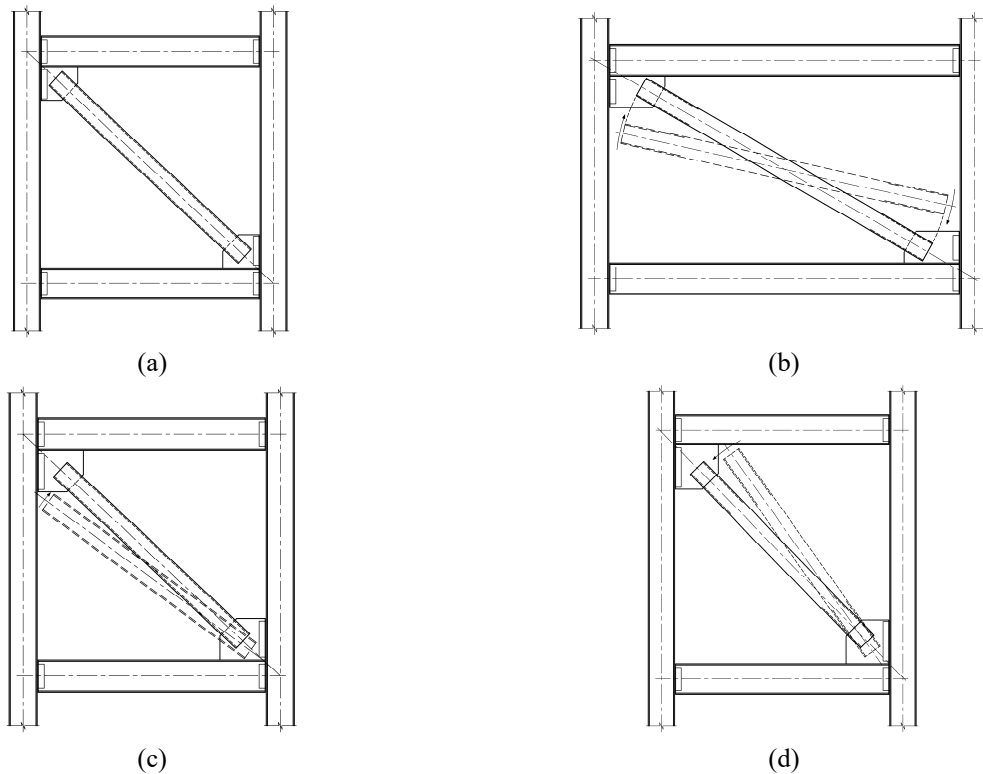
Erection Plans for Slotted Vertical HSS Braces (Dowswell and Lini 2023)
